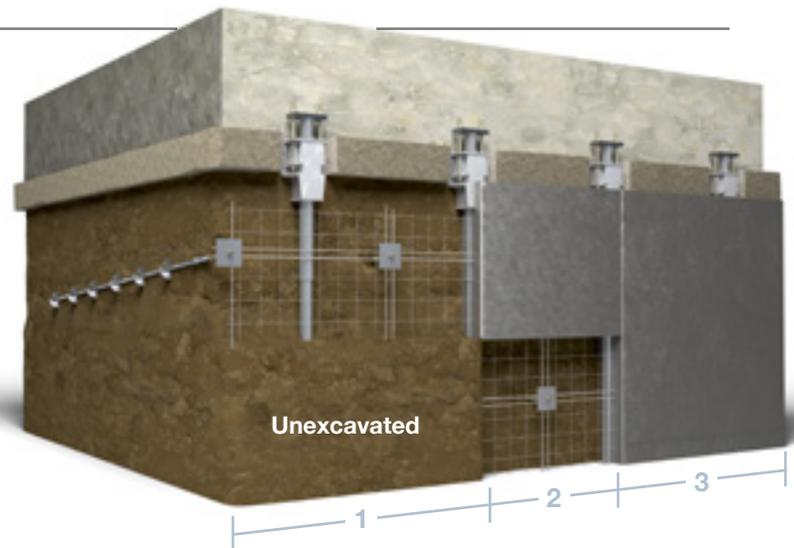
Typical helical soil nail wall and underpinning system. Following pier installation: (1) initial cut, install soil nails and place reinforcing; (2) shotcrete over first cut, make second excavation, install soil nails and reinforcing; (3) shotcrete over second cut
